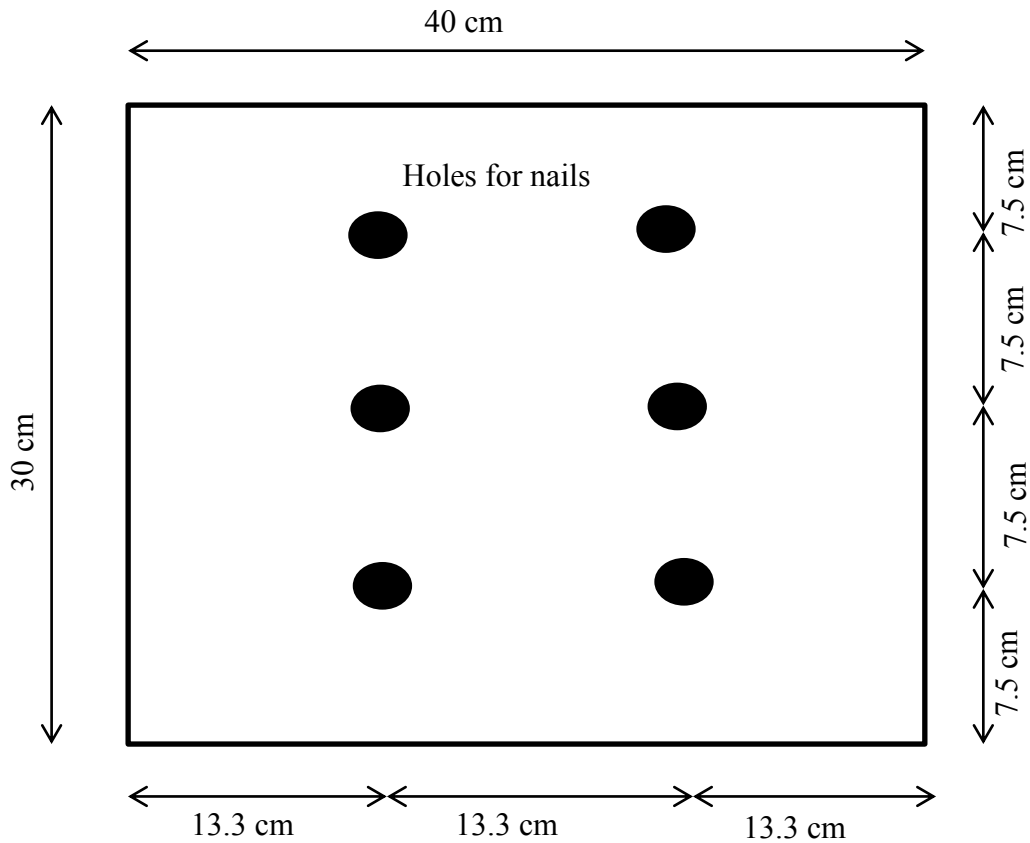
(b) Cross-section of facing of wooden ply.
